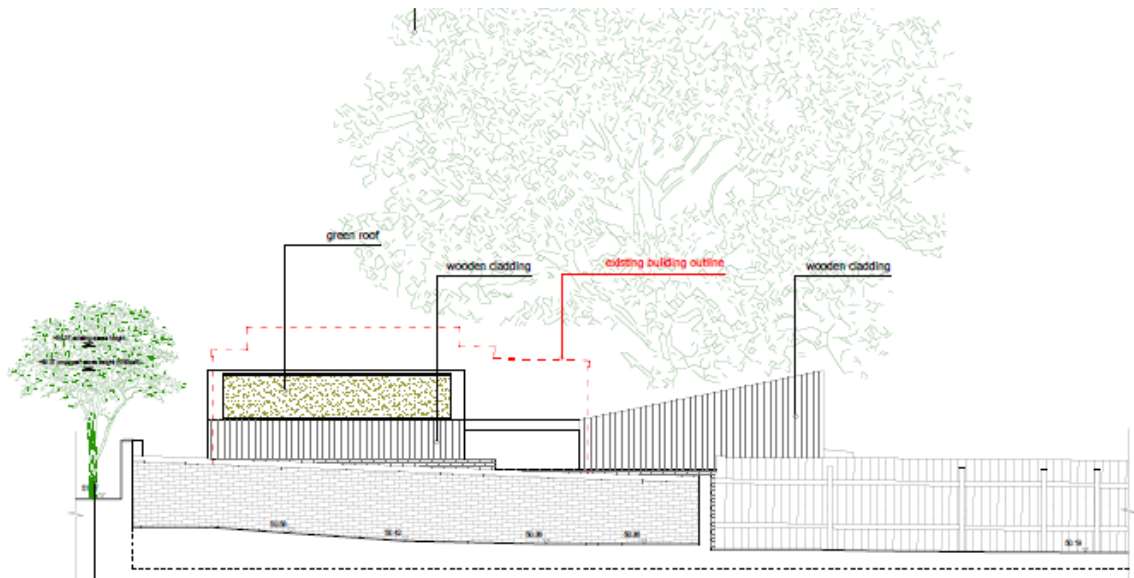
Proposed south-west elevation with red dotted line indicating existing building
